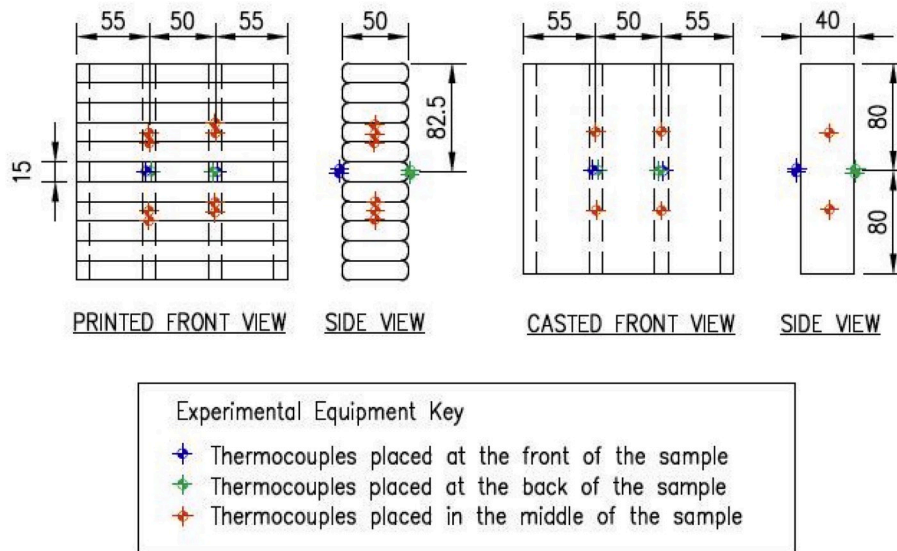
Instrumentation layout. Printed layout (top left images), and casted layout (top right image). All units in mm.
